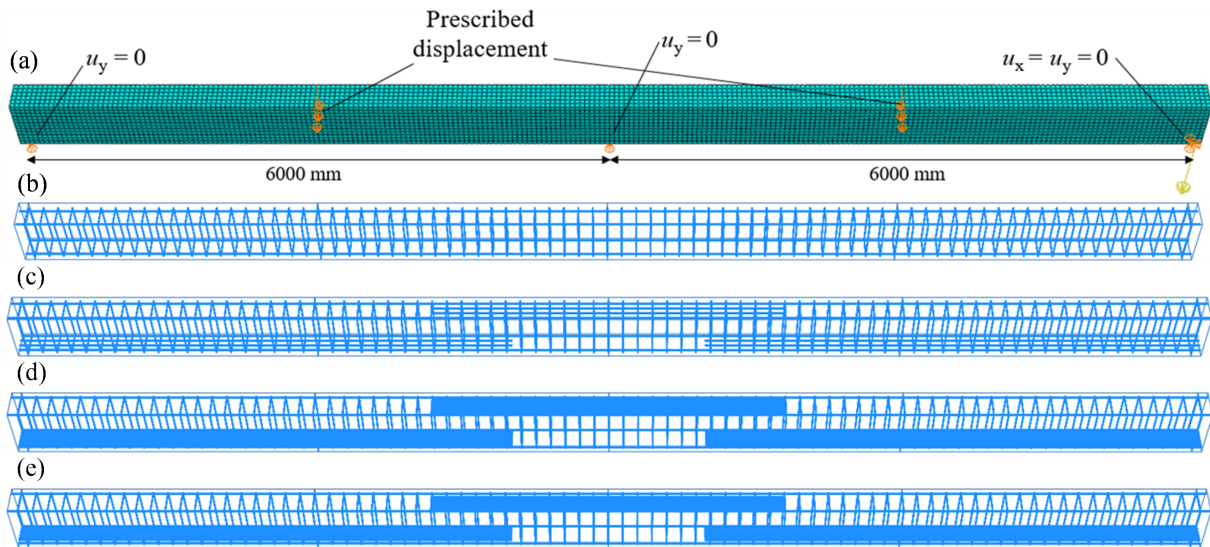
FEM (a) mesh and boundary conditions and (b) reinforcement arrangement for beams C-0.13%, (c) reinforcement arrangement for beams C-0.25%, (d) reinforcement arrangement for beams C-0.57%, and (e) reinforcement arrangement for beams C-1.14%
